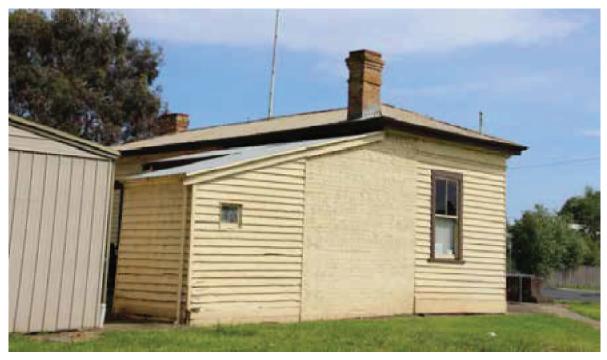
The south-east elevation, showing the two later additions with a skillion-profile roof. The brick section appears to form part of the chimney (reconstructed after its relocation in 1975).
